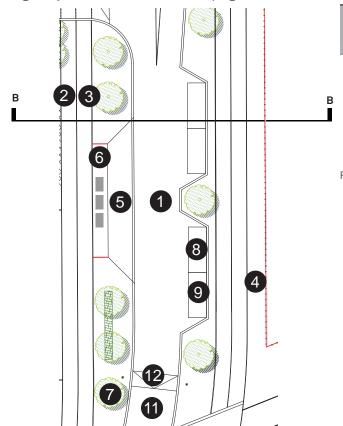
Primary Street Scenario 2 Illustrative Plan
